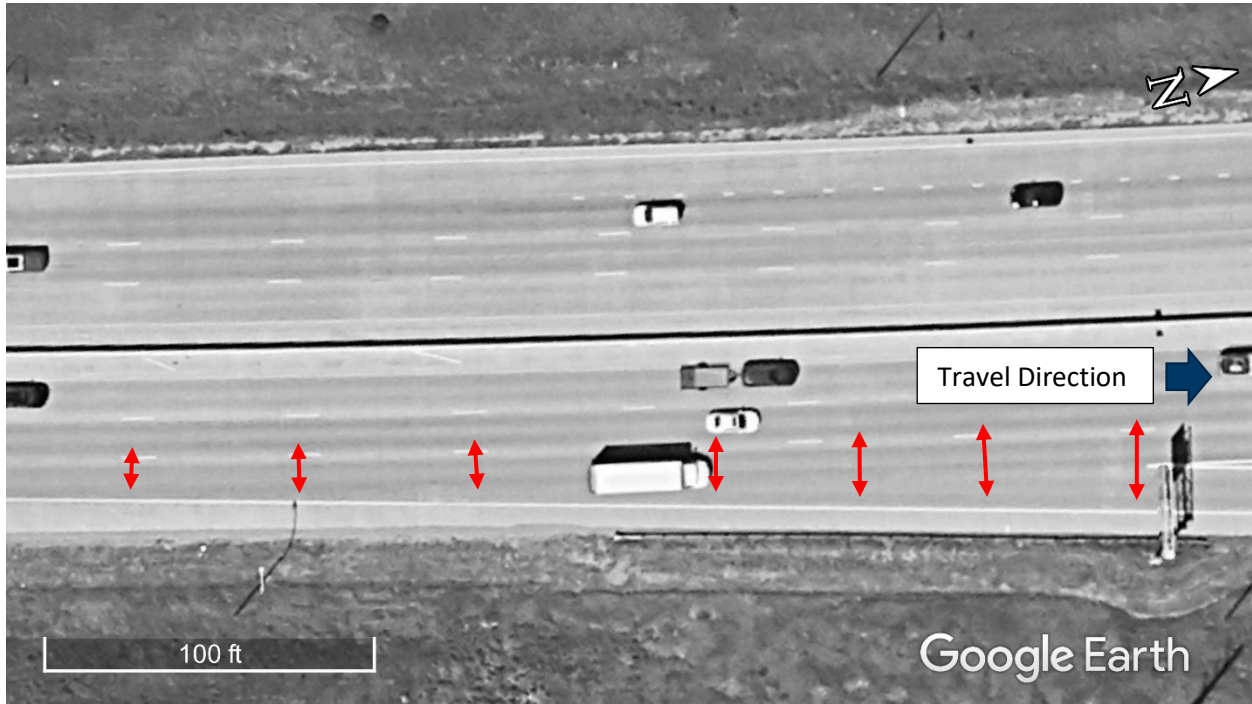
Increment of distance between two pavement markings at transition segments for right side off ramp study sites.
